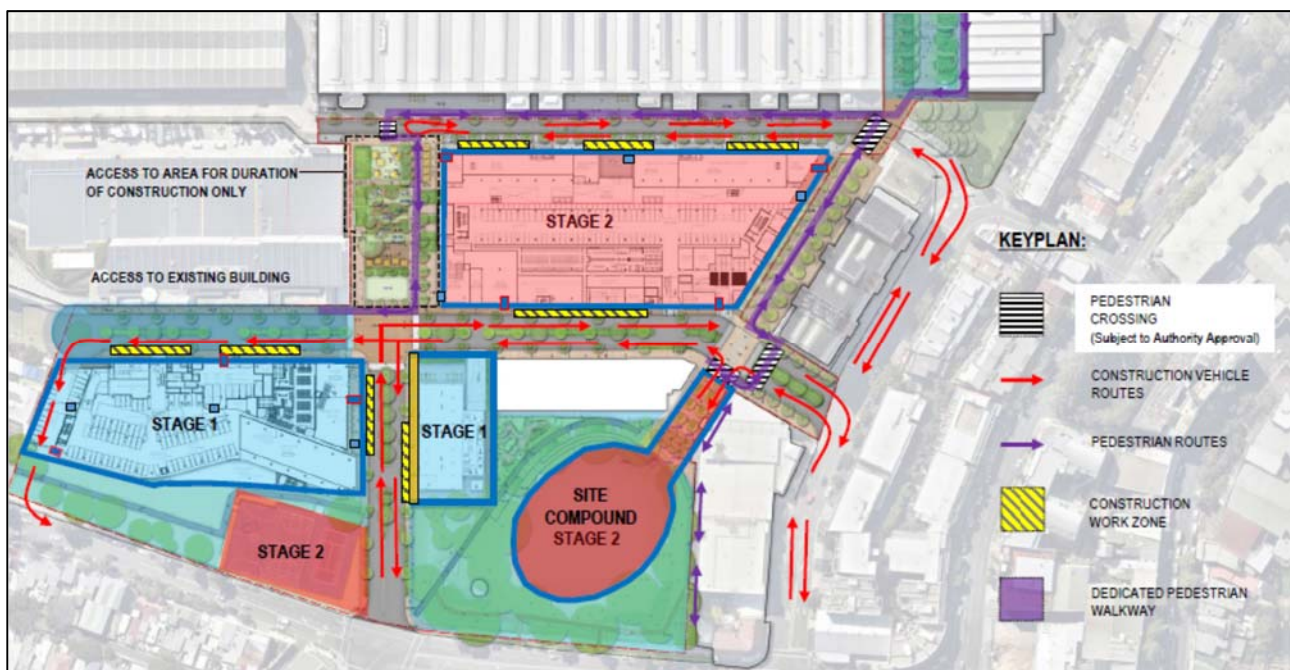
Proposed construction traffic (Source: Applicant's EIS)
